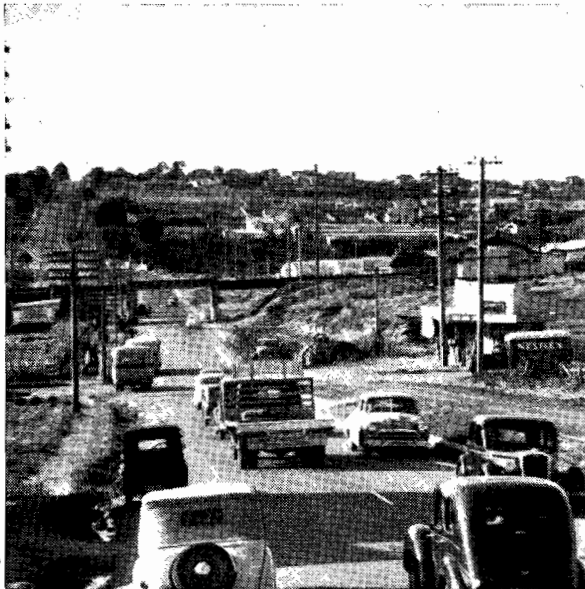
Warrigal Road, Holmsglen, before widening.
